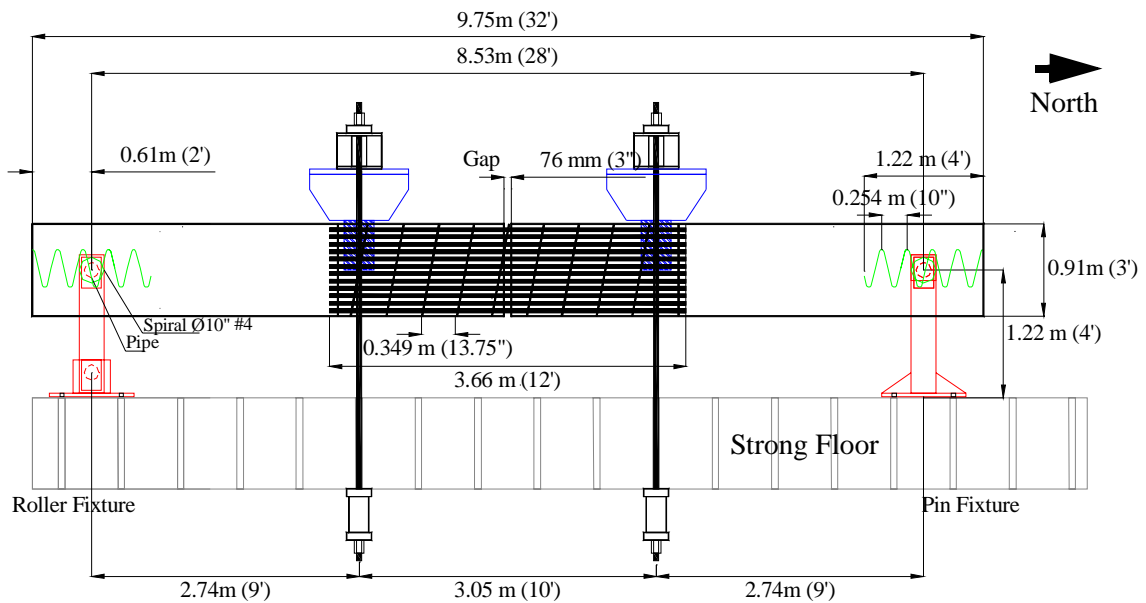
Schematic test setup: Side elevation (Brestel et al., 2003)
